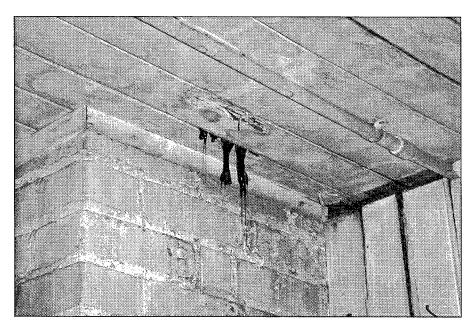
Dried tar (leaked from the tar and asphalt roof above) hanging down from the ceiling in the collections storage area at GCM Services.
